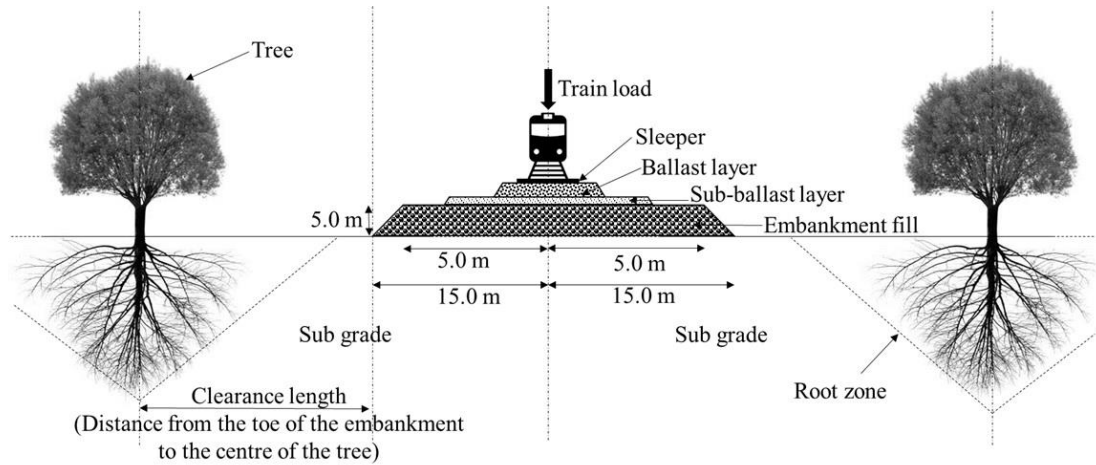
Schematic diagram of a typical section of rail with the user defined embankment section
